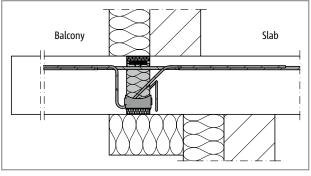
Schöck Isokorb® T type K-E, K-T: Connection for an indirectly supported floor and WDVS
